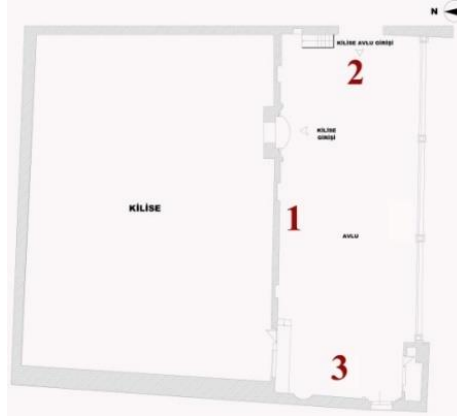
Ground Floor Plan and Wall Numbers (Karataş, 2016; Mardin Artuklu University, Faculty of Architecture Archive)
